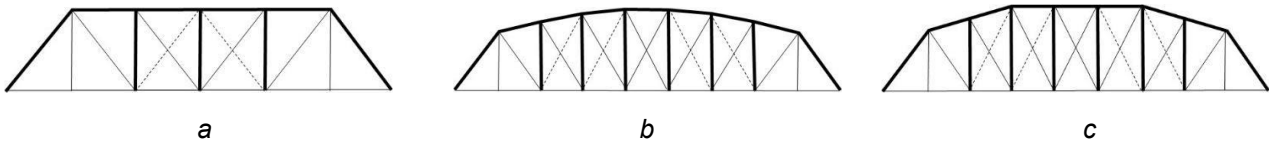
Truss configurations a) Pratt; b) Parker; c) Camelback. (HAER) (Created by F. M. Bartlett)
